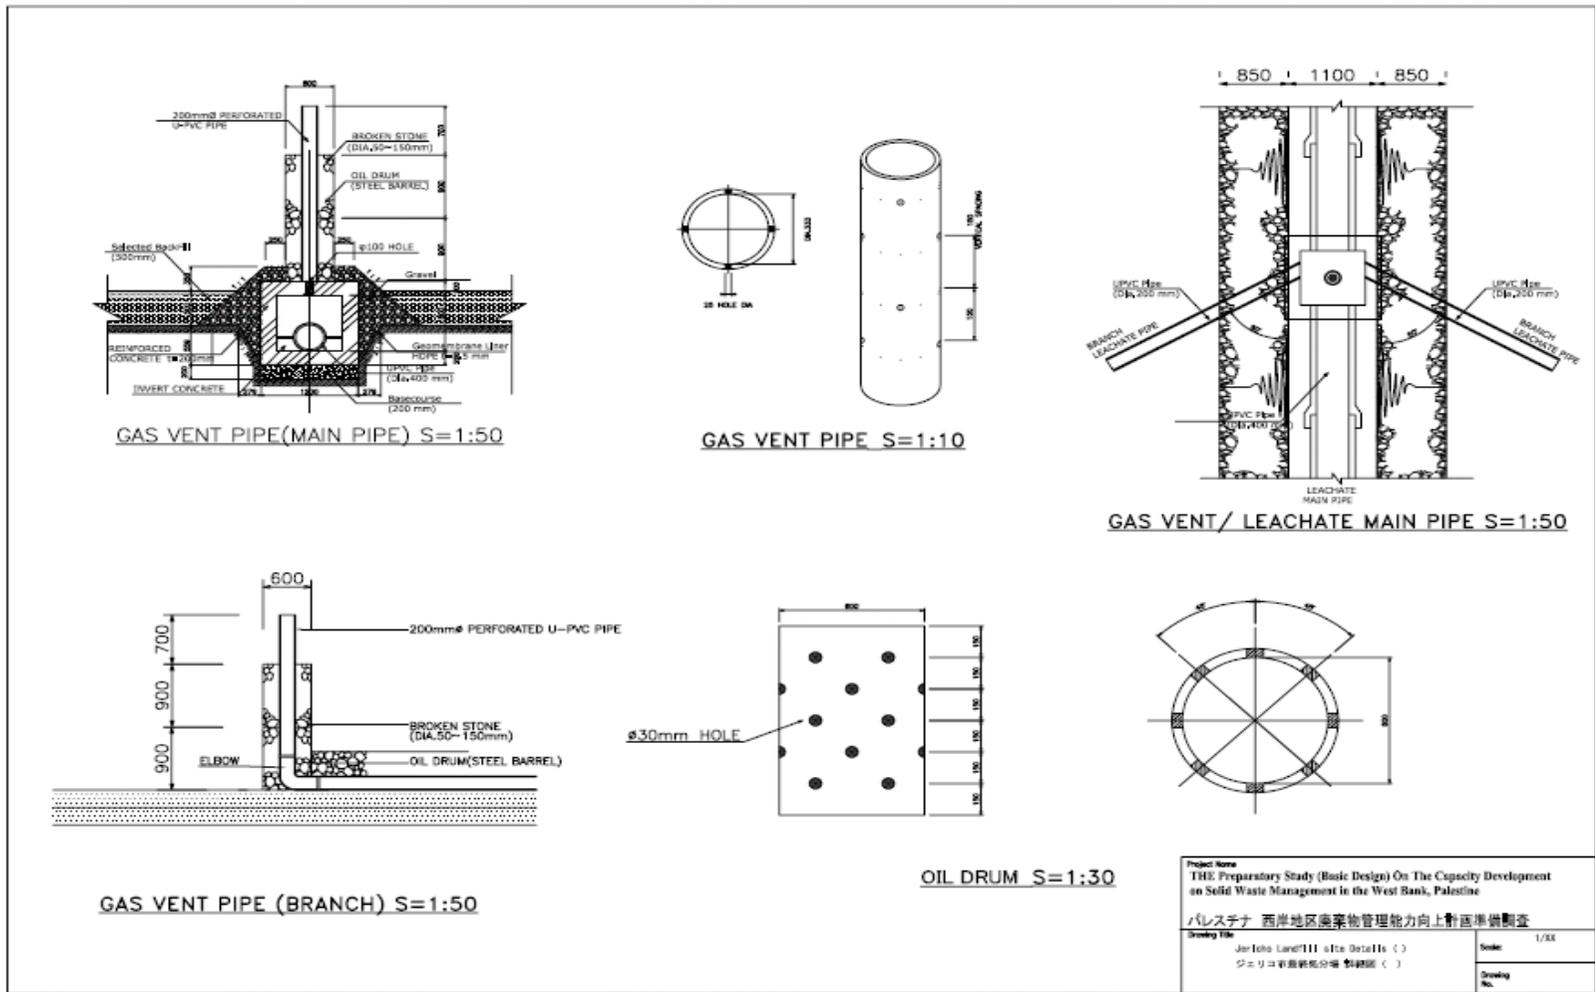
Details of Final Landfill Facilities (1/2) (Jericho JC)
